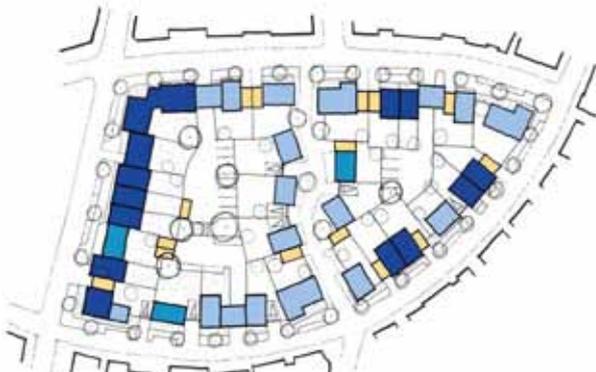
Diagram used to indicate the various proposed building heights by colour – darkest represents the tallest buildings (CABE, 2008)
